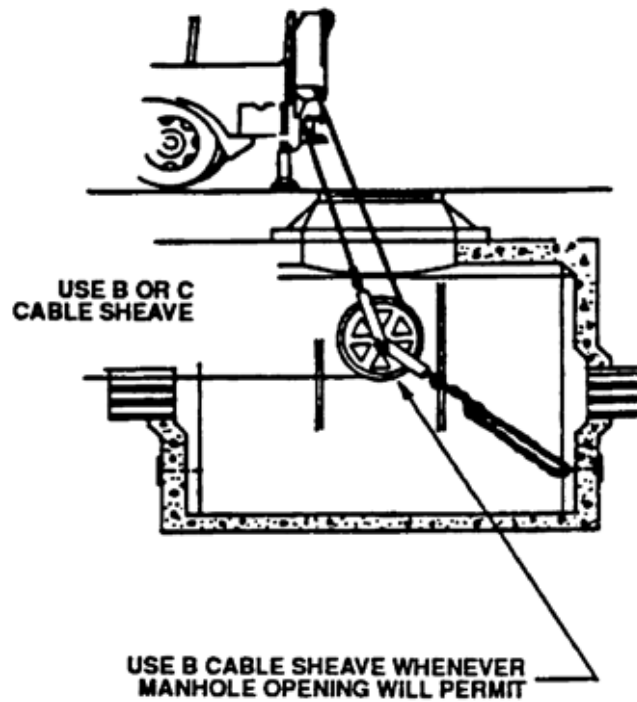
Pulling Arrangement Using B Cable Sheave Shackle and Winch Truck
